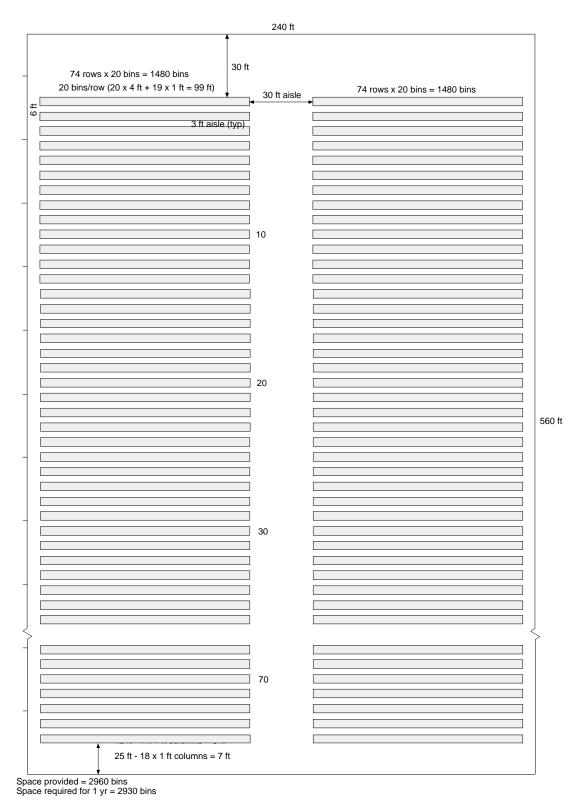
U3O8 Storage Building Plan Conversion to U3O8 and AHF (15 yr)
